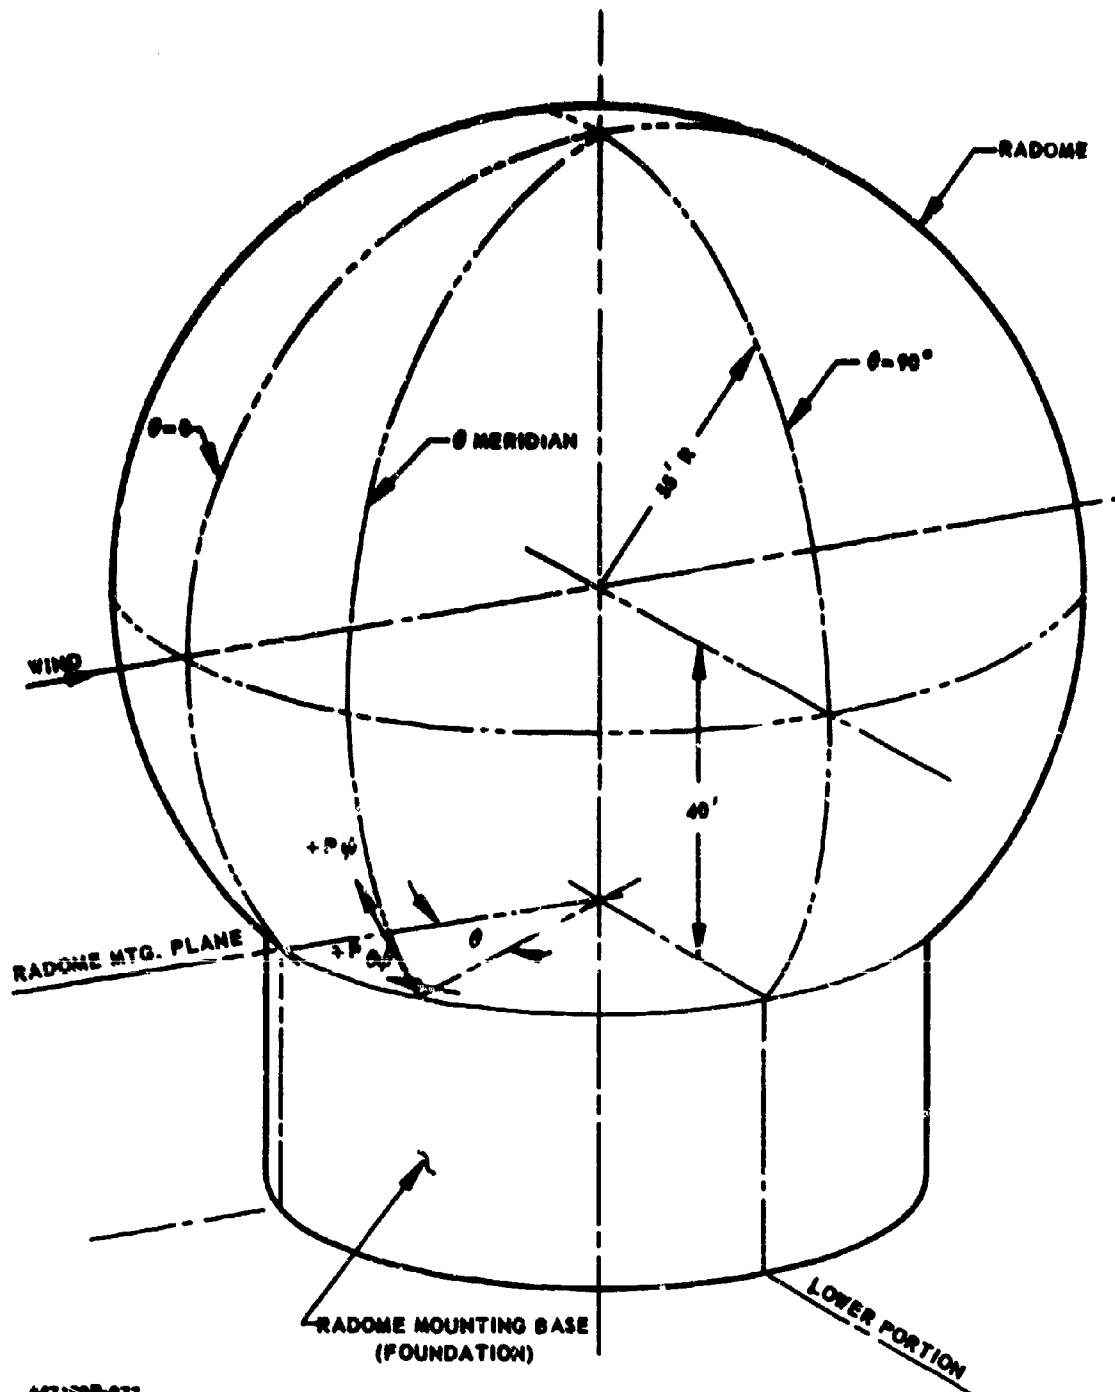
Test Tracking Stations, Redome Criteria - 110-foot Space Frame
